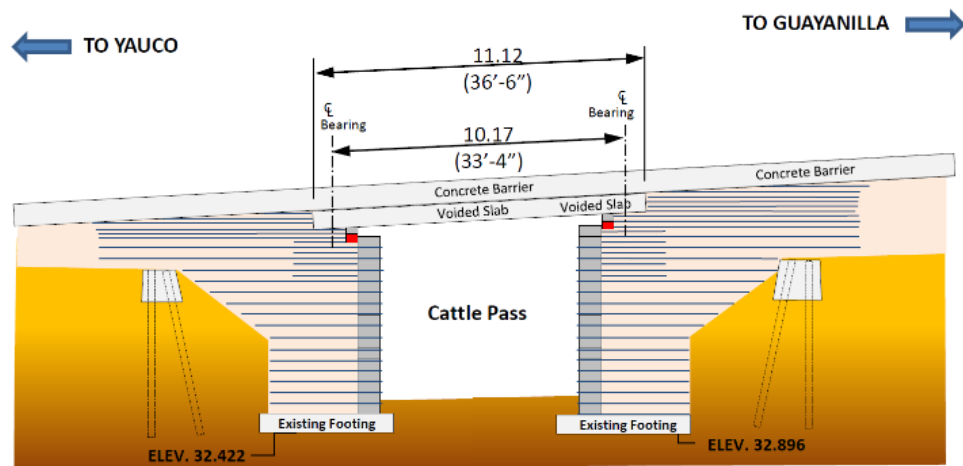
Side view (facing north) of 1121/1122 GRS-IBS Bridge in Yauco County (Pagan et al. 2014)
